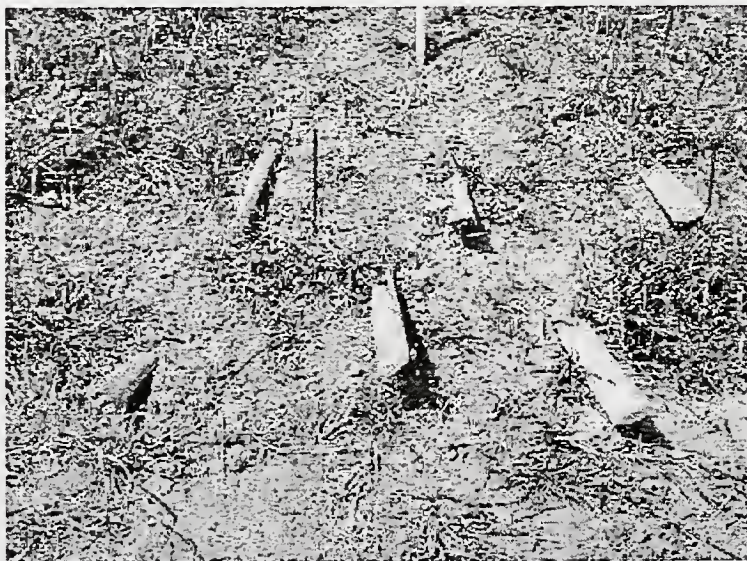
Test embankment with six horizontal wick drains (Santi, 1999).
